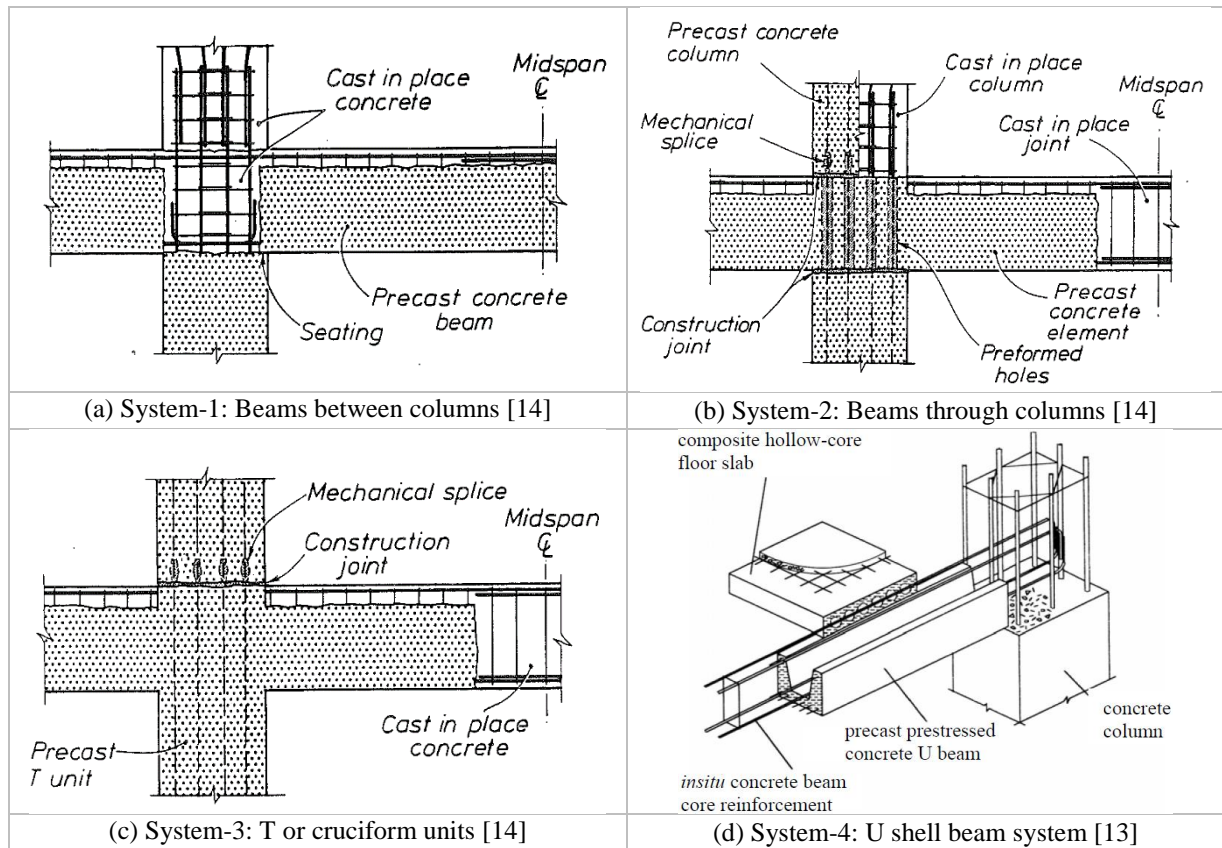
Equivalent monolithic precast concrete frame systems with use of wet joints
